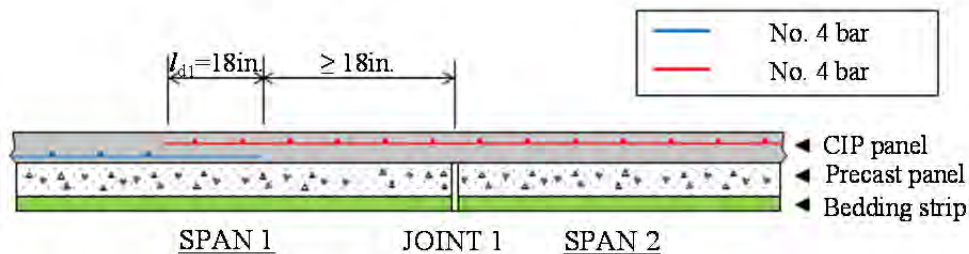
Section showing details of longitudinal splices, Wharton-Weems Overpass (Joint 1)
